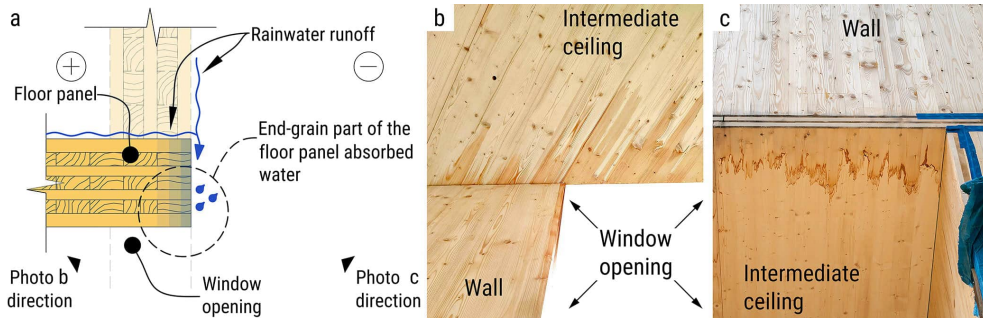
CLT intermediate ceiling (floor) connection with a window opening (a), where frequent wetting occurred (b = building B, c = building F).
